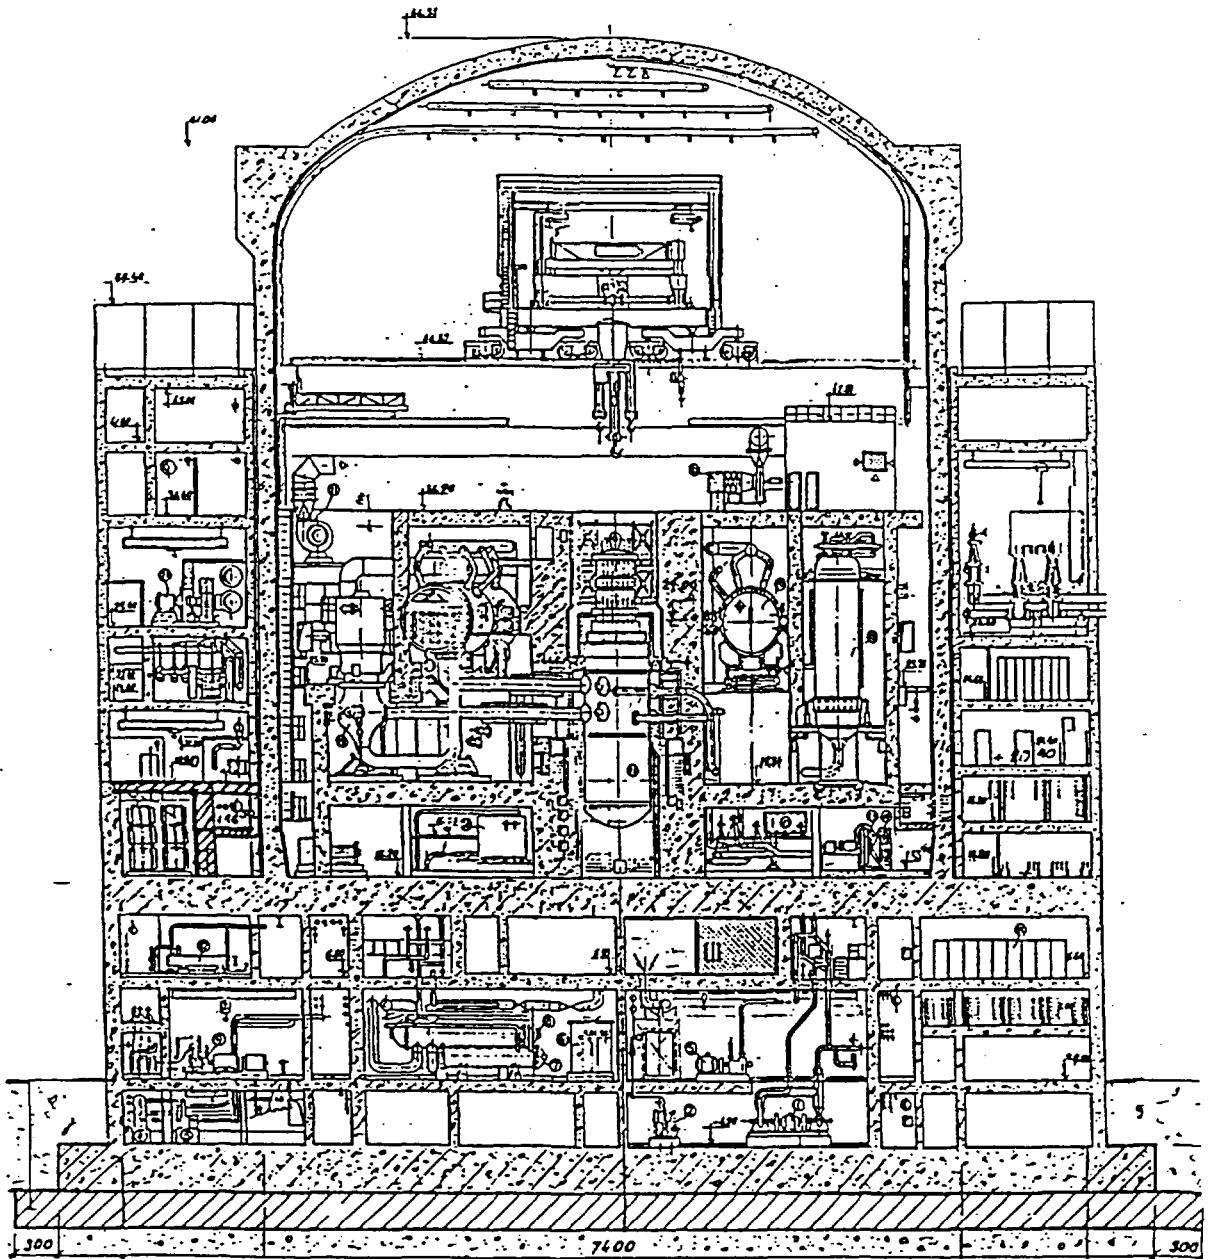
WWER-1000 MW Reactor Building Cross Section
